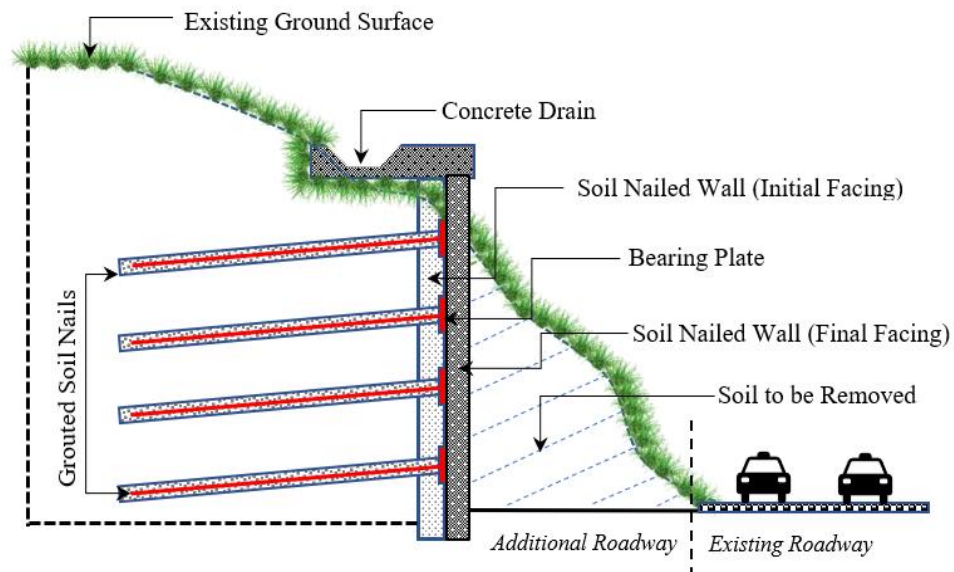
Distinctive cross-section of a soil nail wall (modified after Porterfield et al.,1994)
